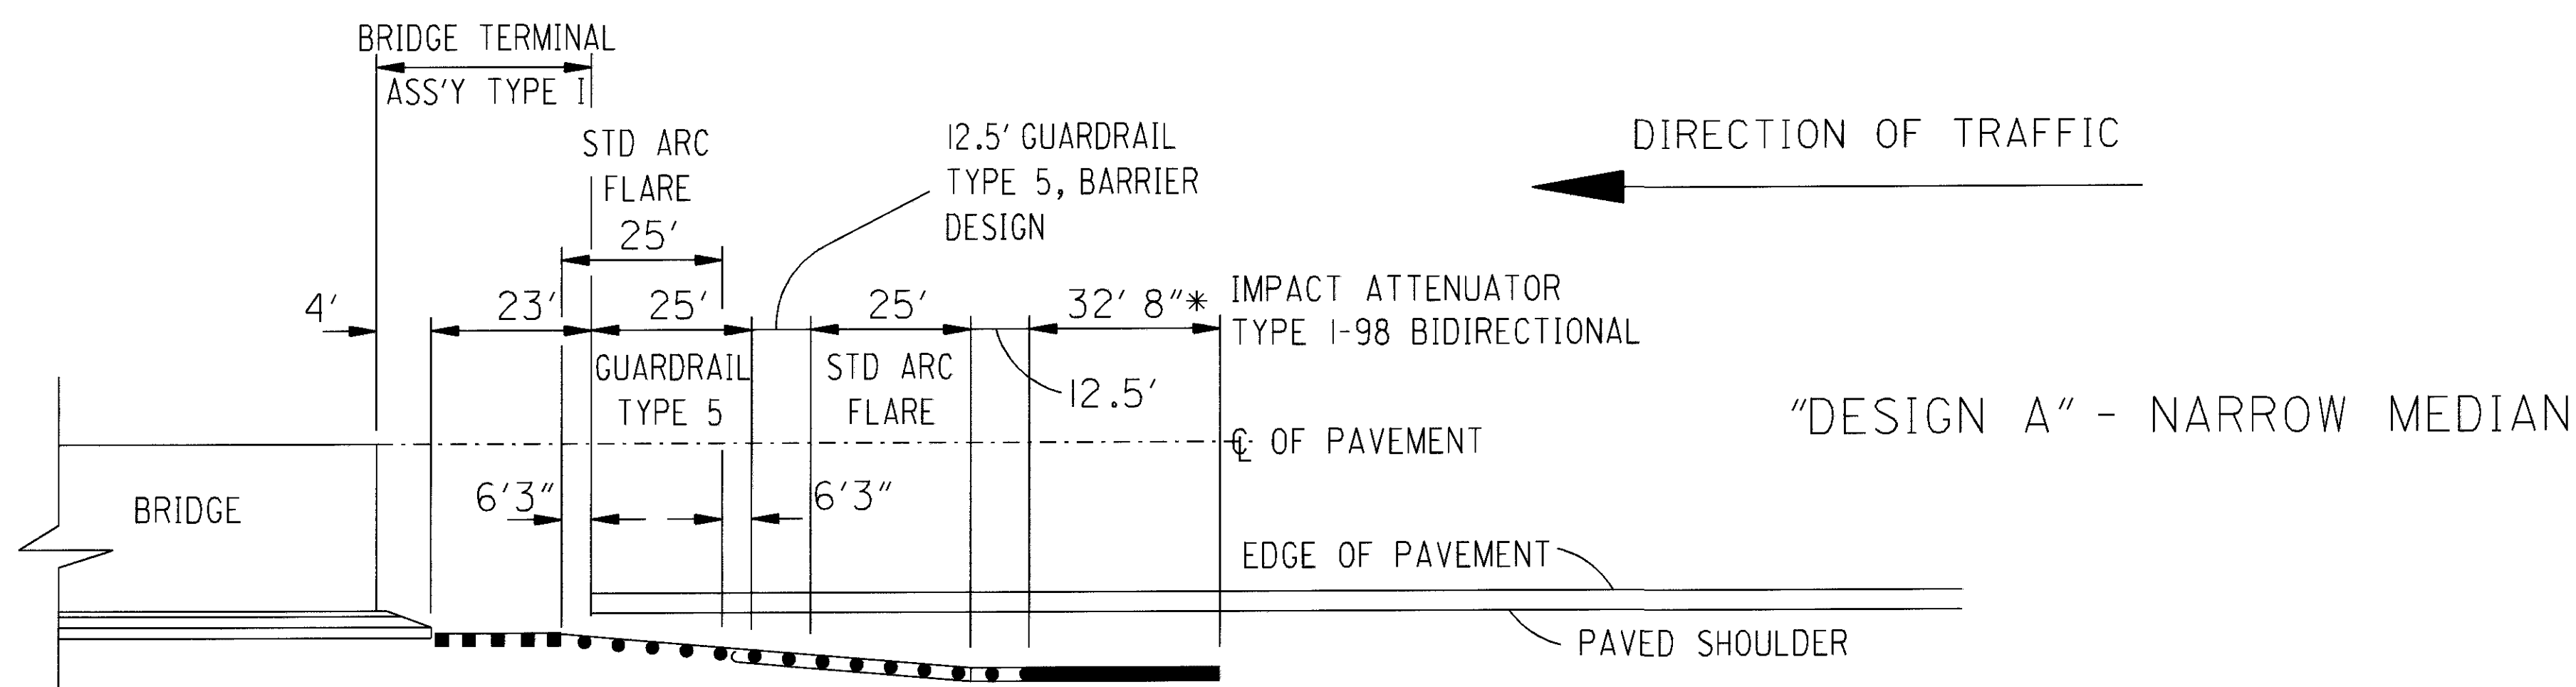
DETAIL FOR MEDIAN GUARDRAIL AT PIERS:
